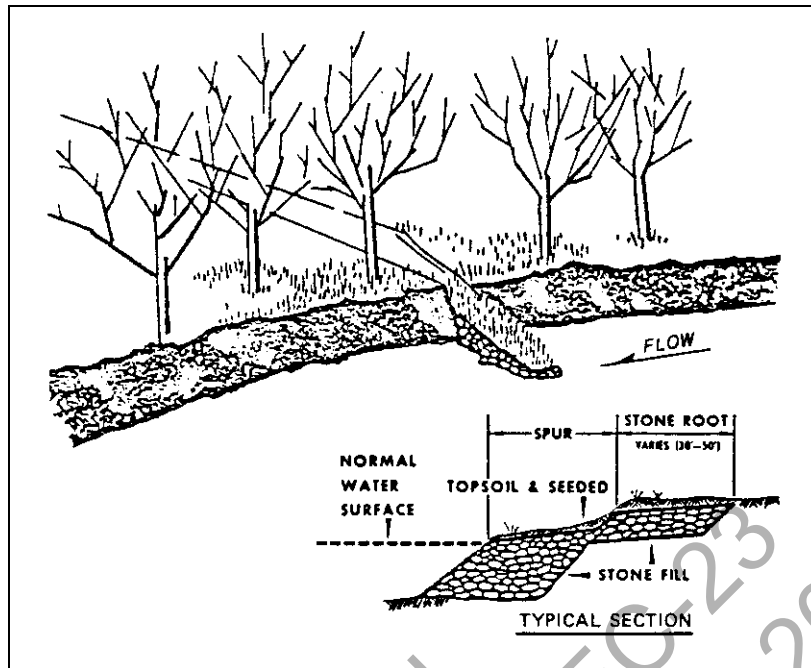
Perspective view of hardpoint installation with section detail (after Brown).⁽²⁾
